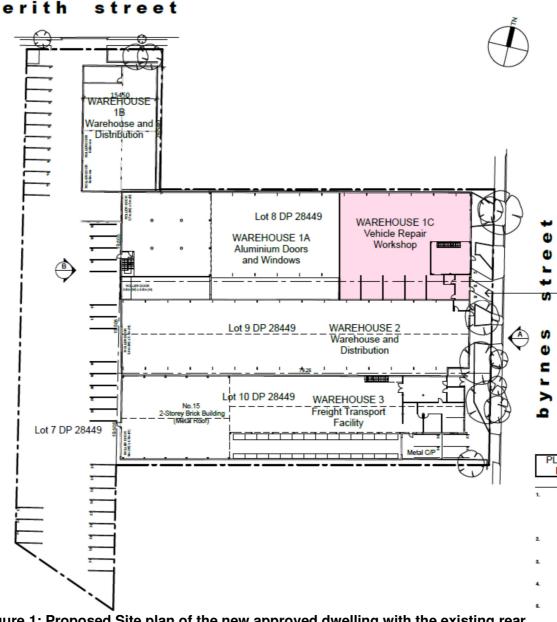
Proposed Site plan of the new approved dwelling with the existing rear outbuilding conditioned to be demolished.
